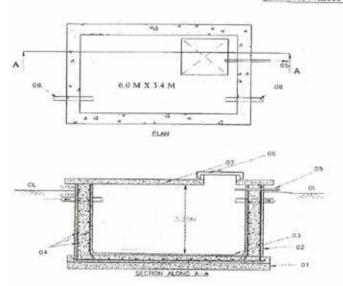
AutoCAD drawing of Plan and Cross-section of proposed Sump Tank.
